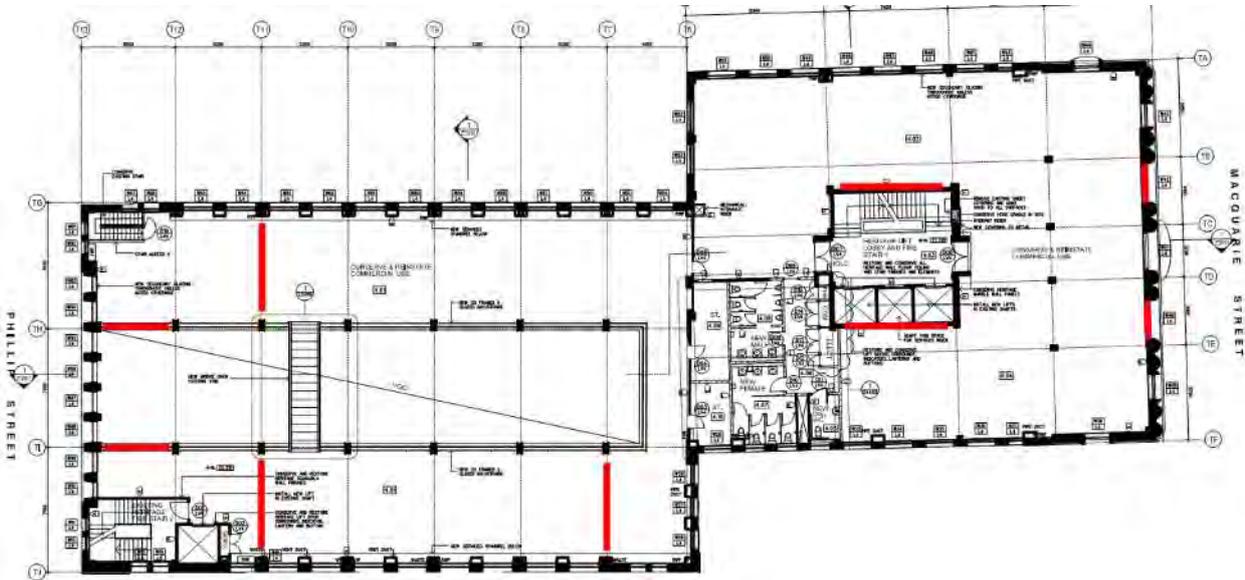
Option for locations of bracing shown on Mezzanine Level (L4) plan
